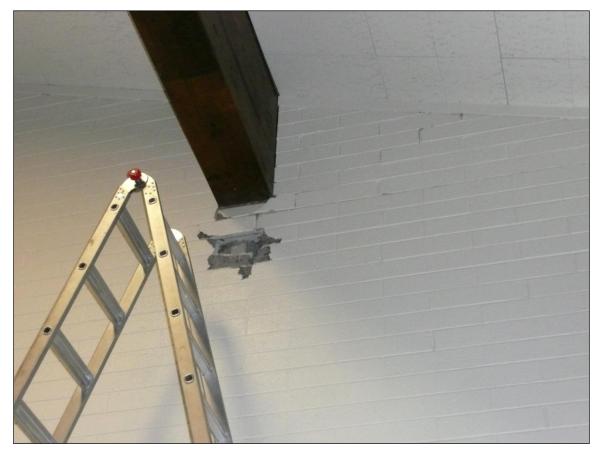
Damage to concrete blocks under a large glulam support beam in the Wells Ward LDS church. A column of concrete should have been poured under the beam, but the blocks were only partially filled with concrete. *Photograph by Glen Palmer*.
